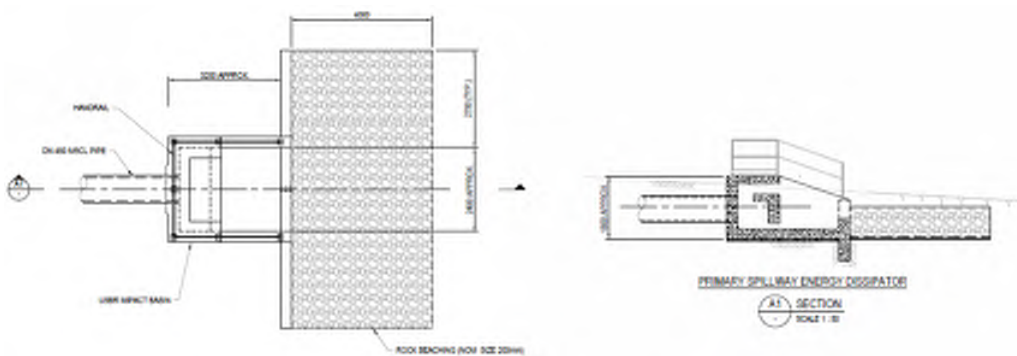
Plan (left) and section (right) of Energy Dissipator
